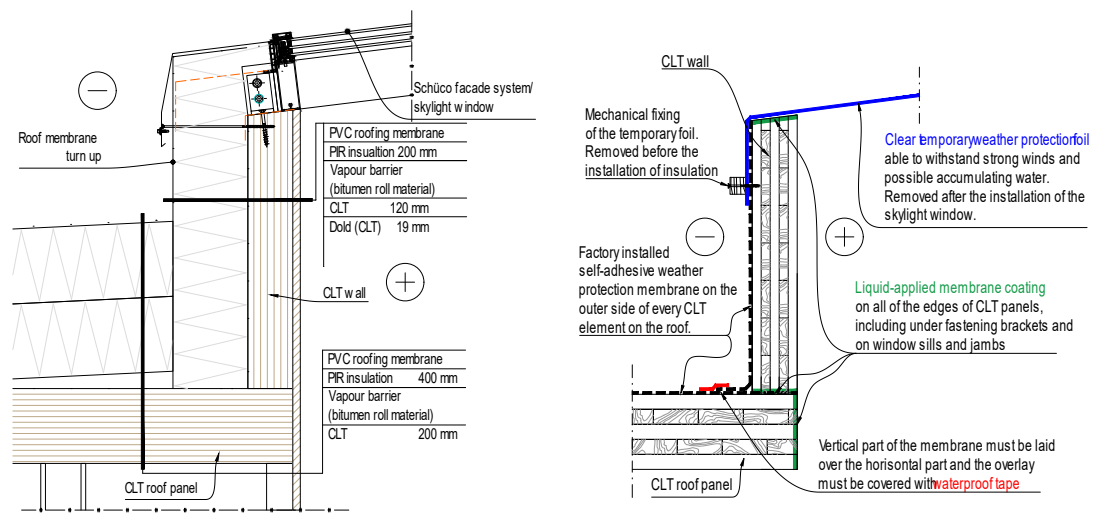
Design drawing (left) of roof to skylight shaft connection and our proposal (right) of wetting mitigation practices.
